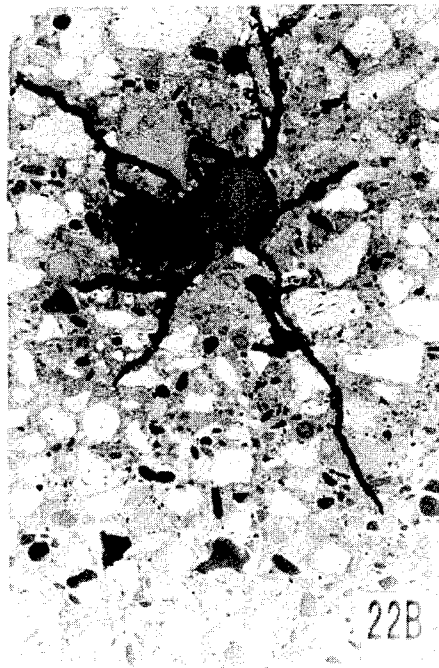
Cross-sectional view of steel bar in slab 22-B with cracks highlighted (the top crack extends to the slab surface)
